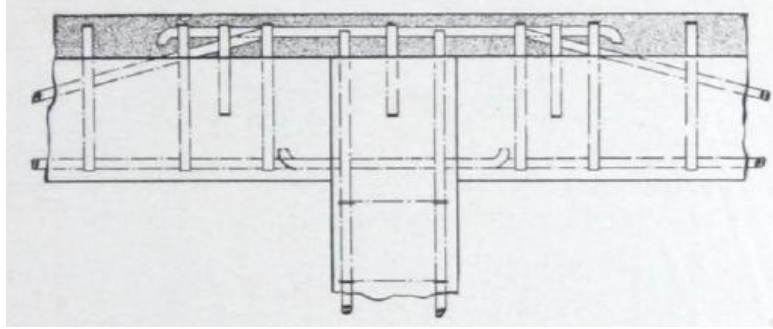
Reinforcement of beams over support in Hennebique system [32]
